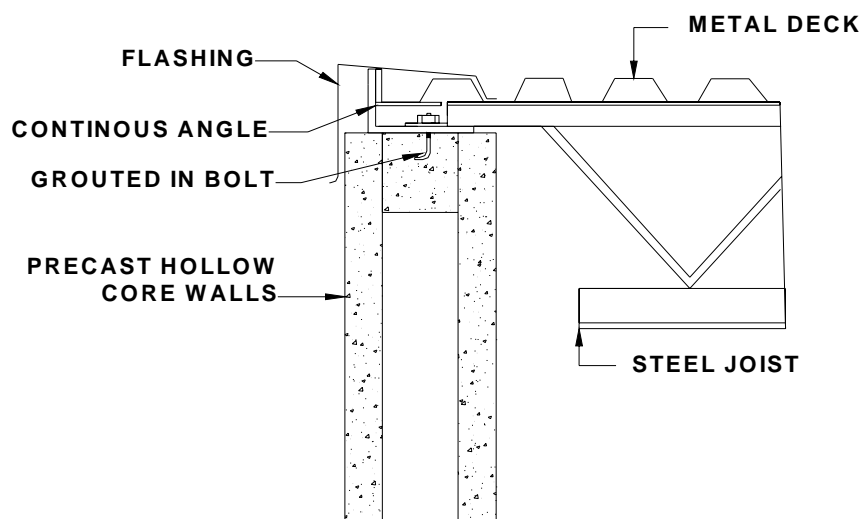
Load bearing precast hollow core wall panels supporting the steel frame (Precast Technology, 1991).
